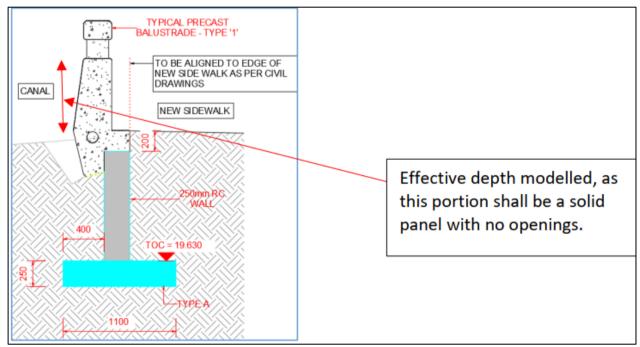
Proposed concrete balustrade and stormwater modelling applied (source: GIBB, 2021)
